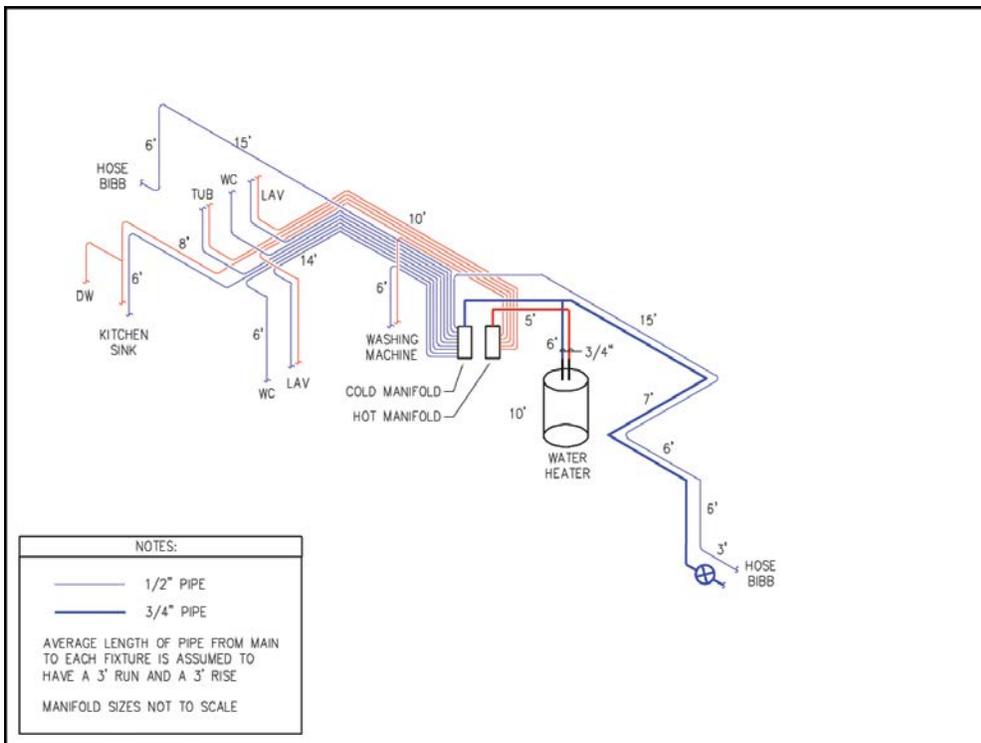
Parallel Isometric Riser for the Townhouse
